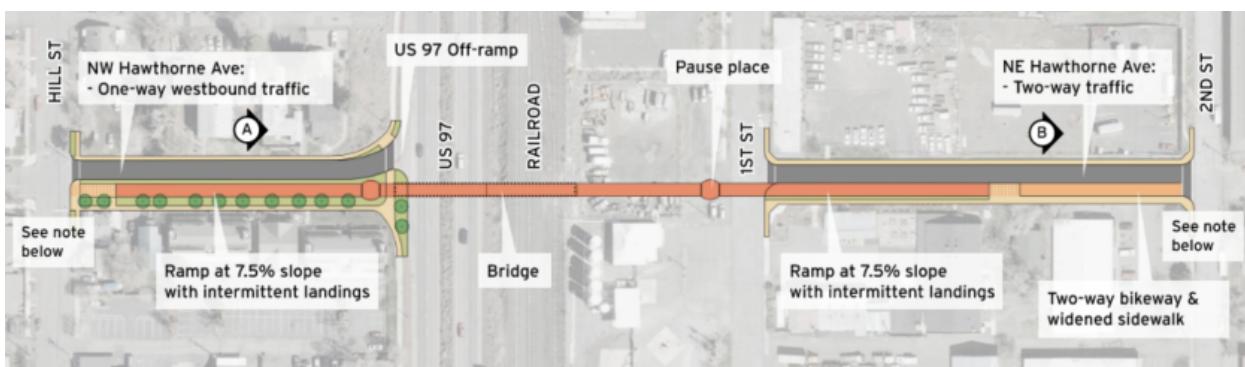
Hawthorne Avenue Concept 1A: Plan View
